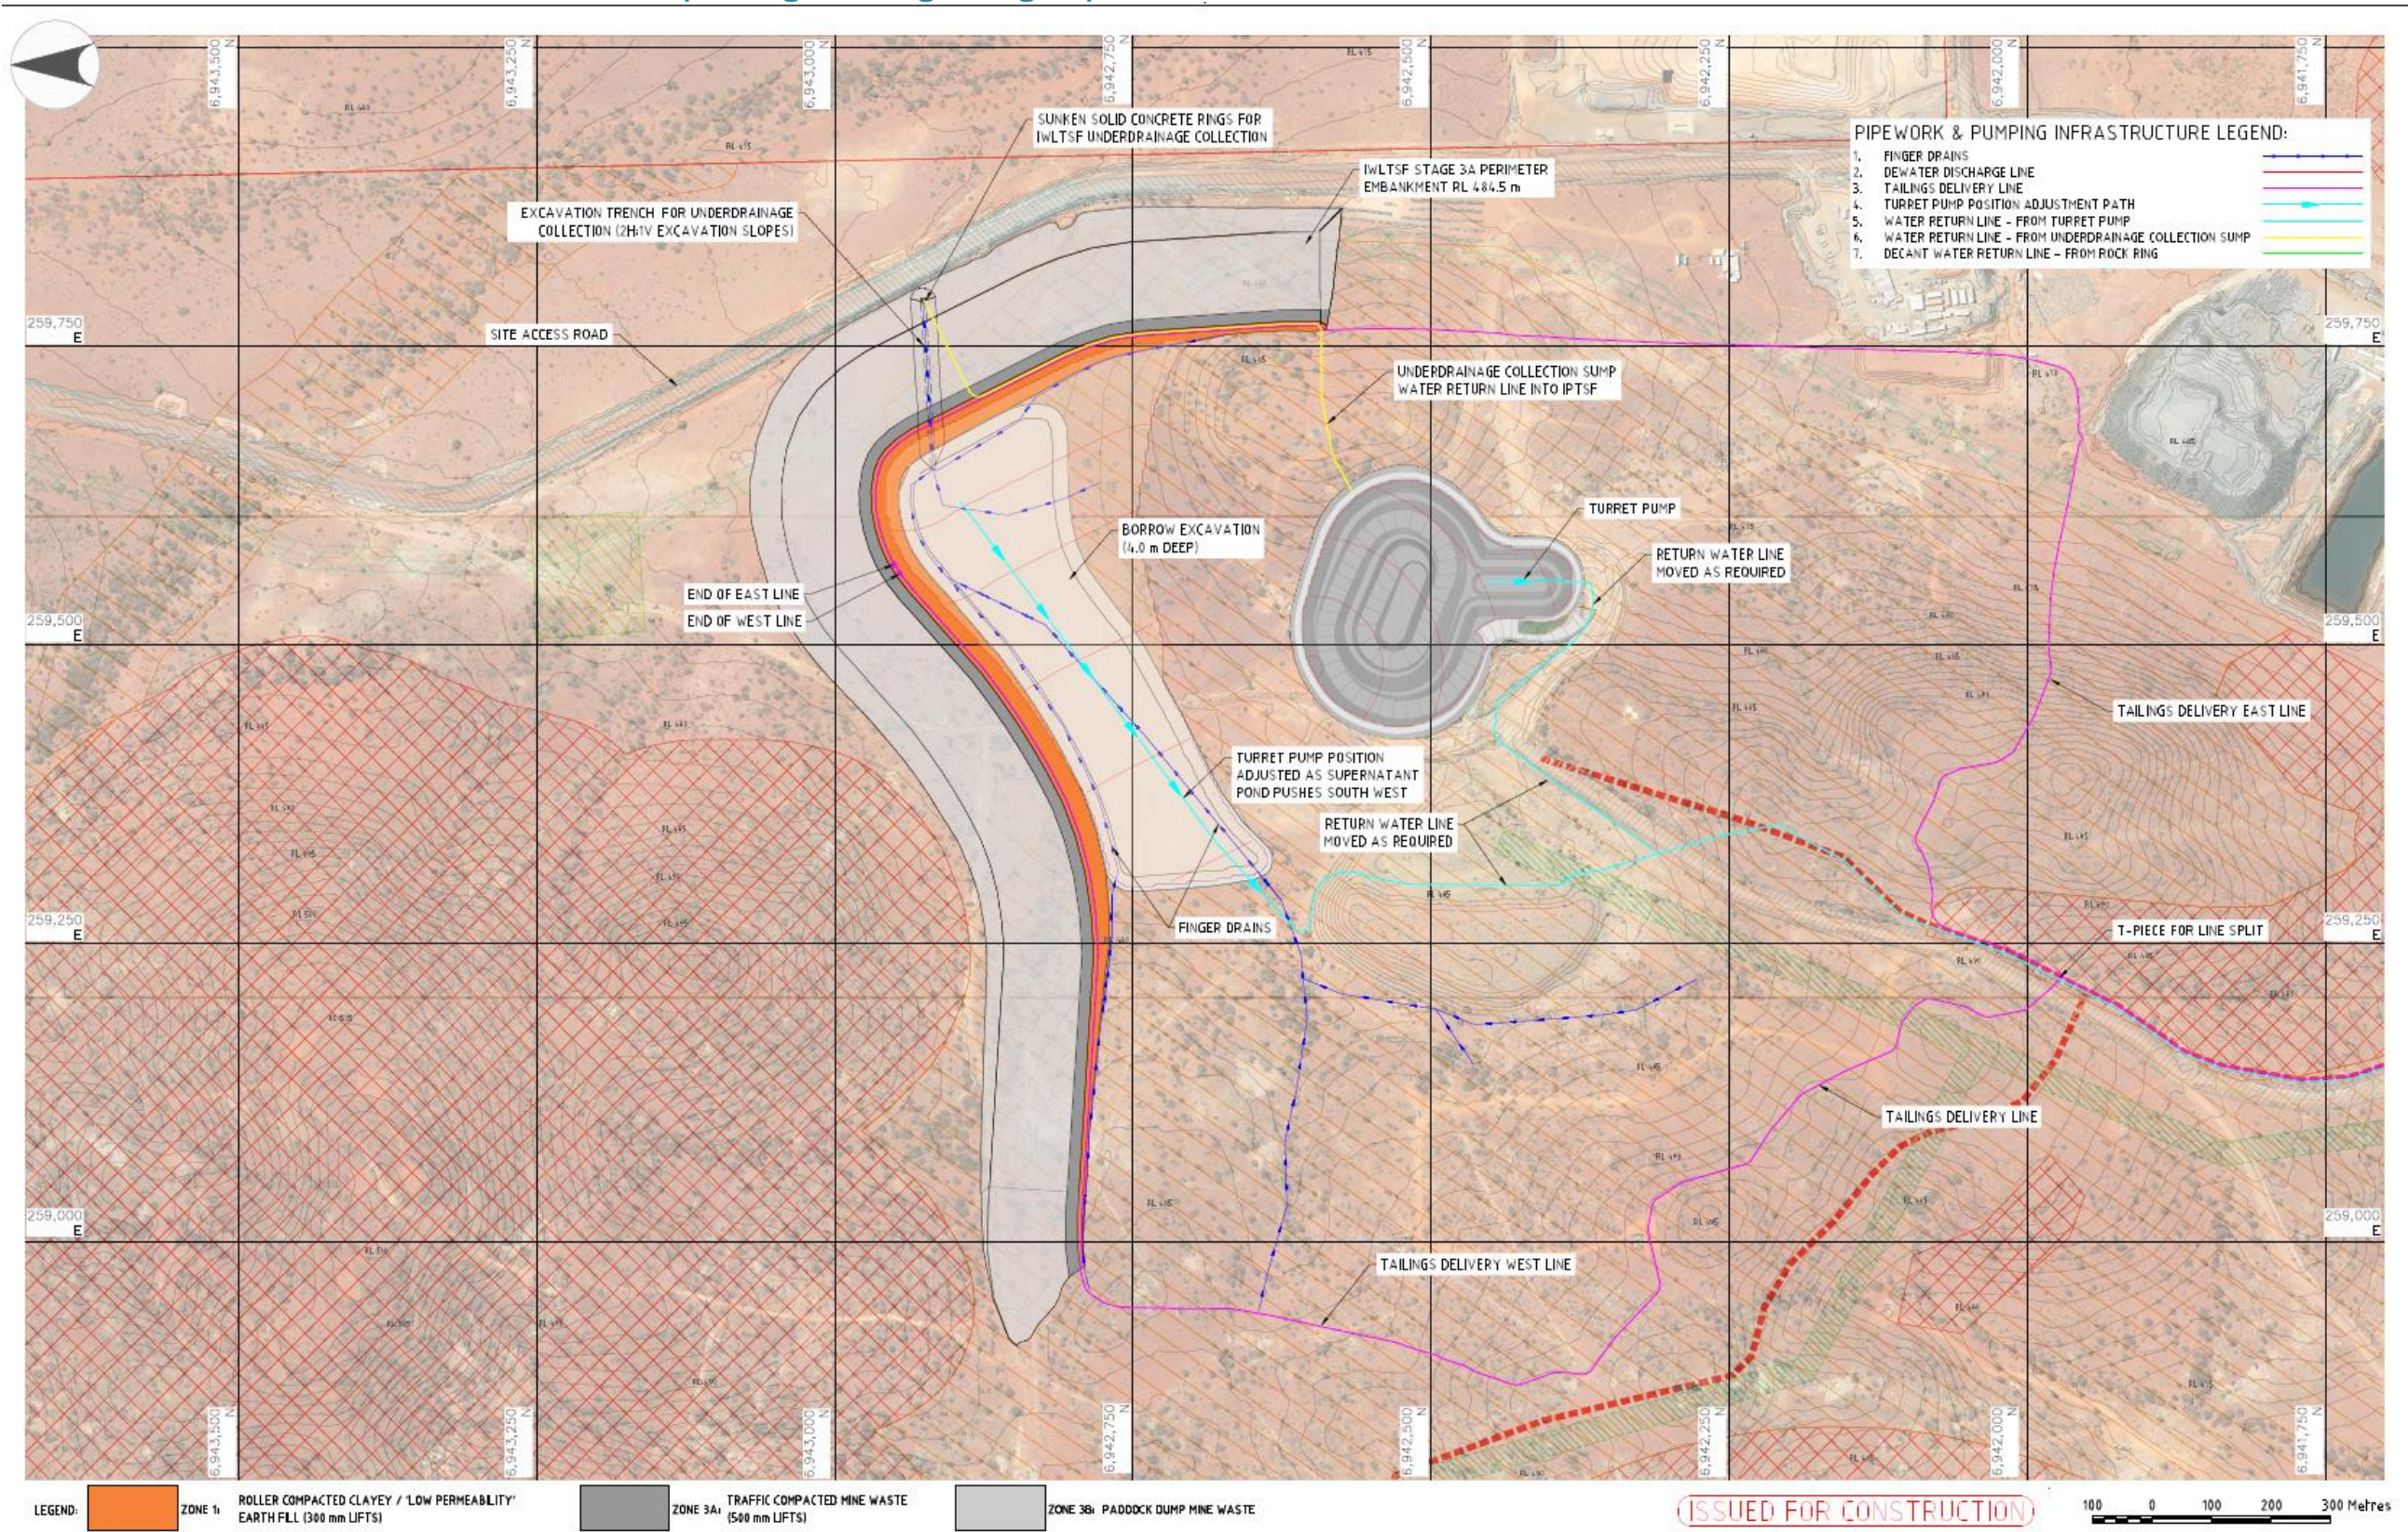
Underdrainage, pipelines and pumps positions for TSF (Tailings storage stage 2)
